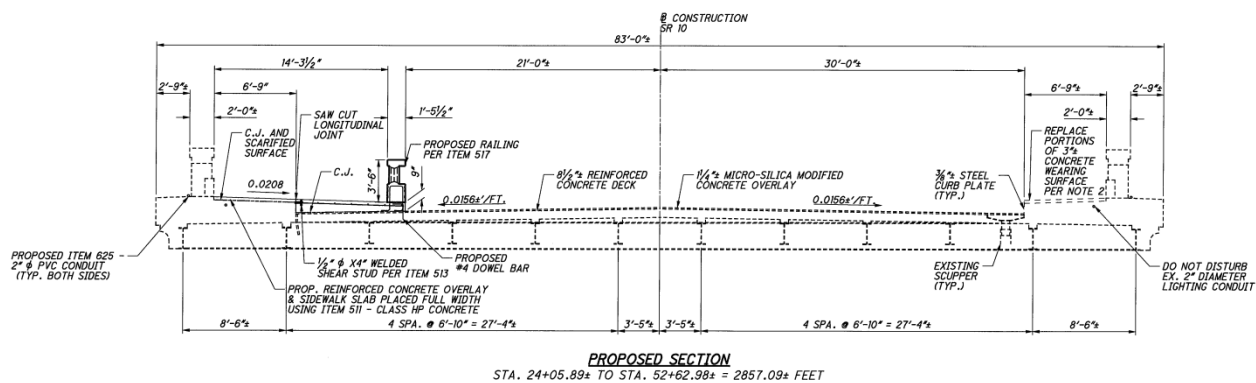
Proposed sidewalk expansion along north sidewalk.
